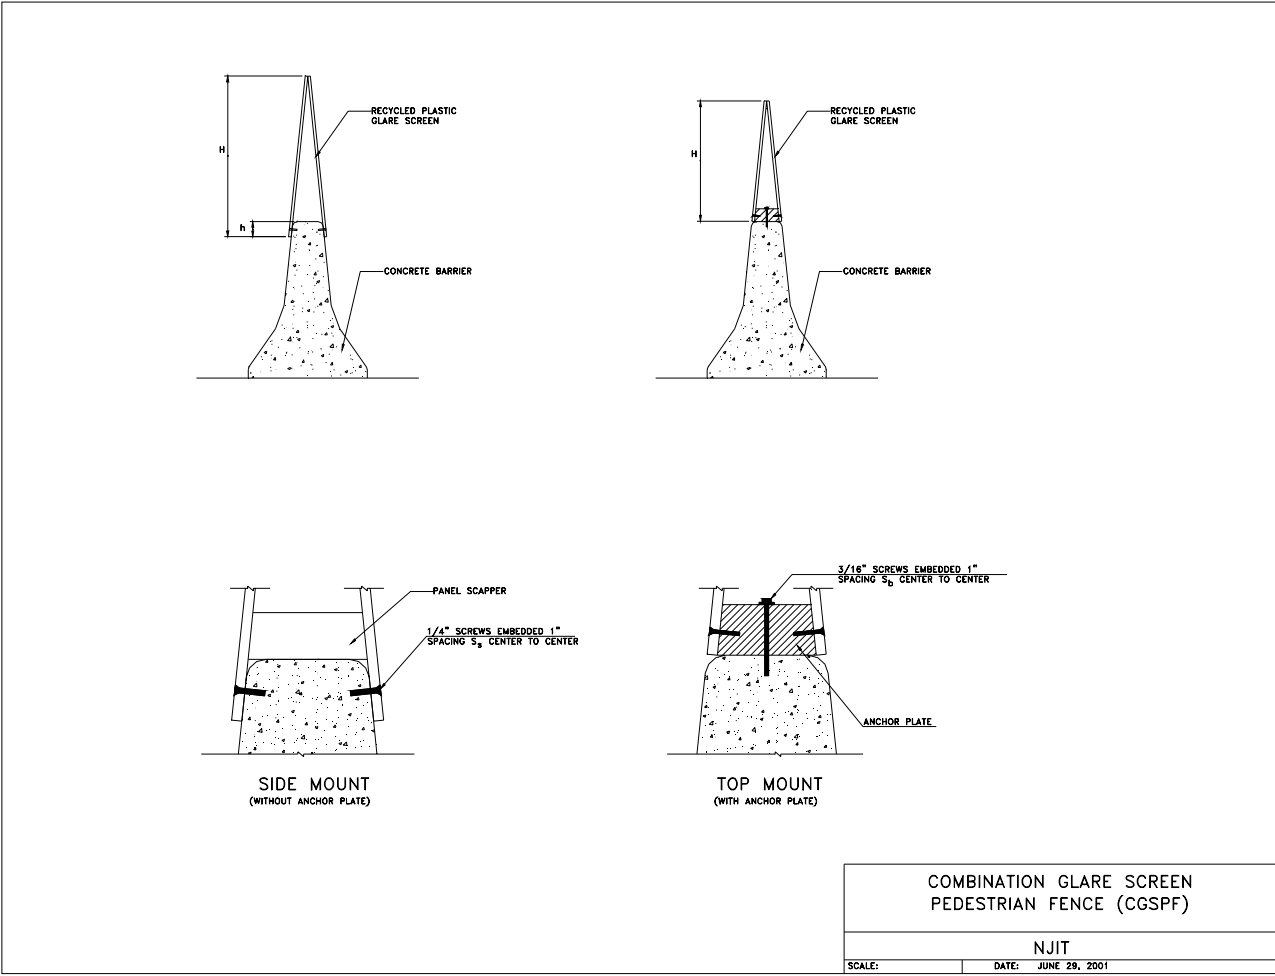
Cross-section, dimensions and details of the two mounting techniques.
